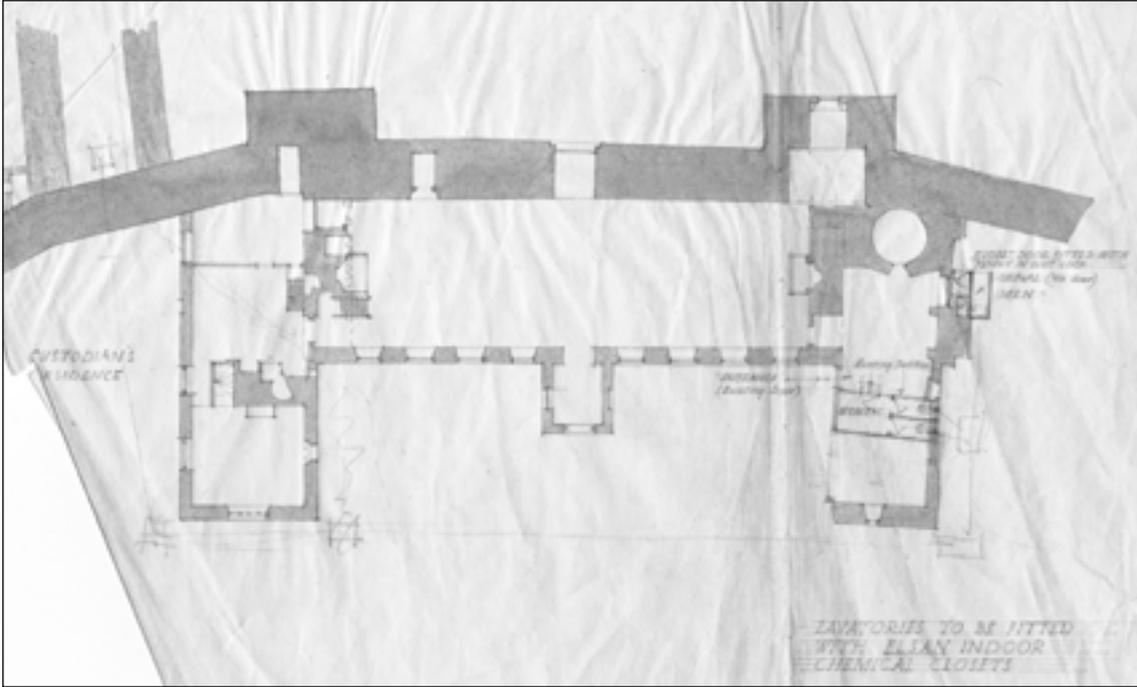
A plan of c.1952, showing the former workhouse buildings (Red House, 1729 block, White House). North is to the right. (TNA WORK 14/685)
